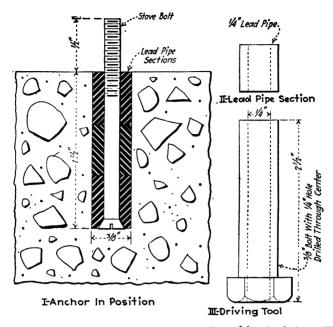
Expansion anchor made of sections, II, of  $\frac{1}{4}$  in lead pipe. They are driven in around the bolt with the driving tool III.
